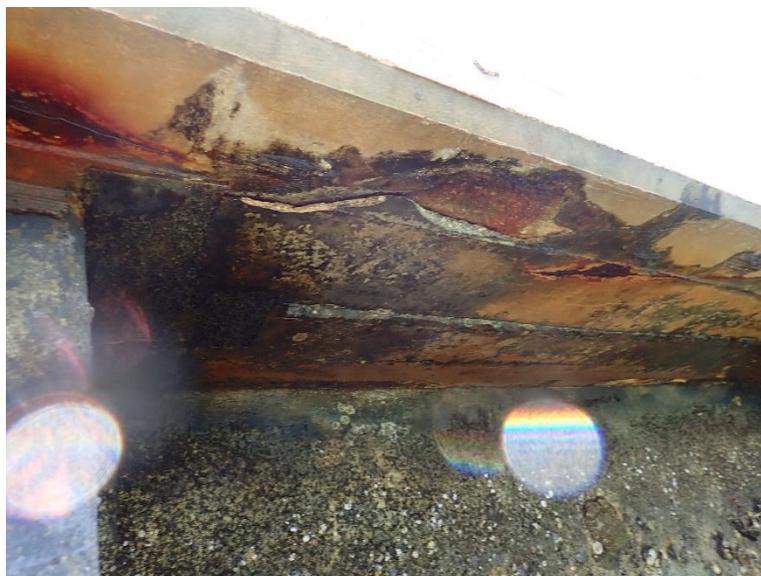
Cracking with corrosion staining at wet face of concrete cap at East seawall
